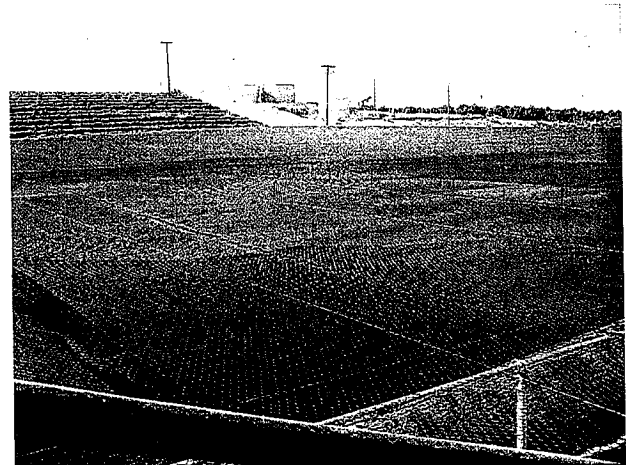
View of a separation sump and wastewater sumps looking west.
